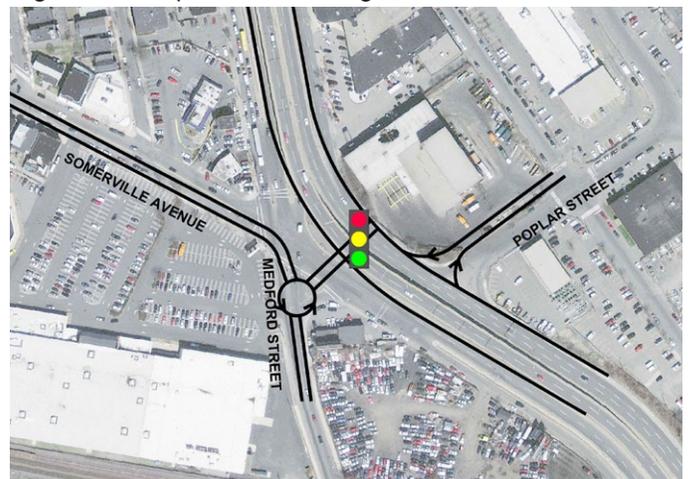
Somerville Avenue 3-Leg Roundabout
